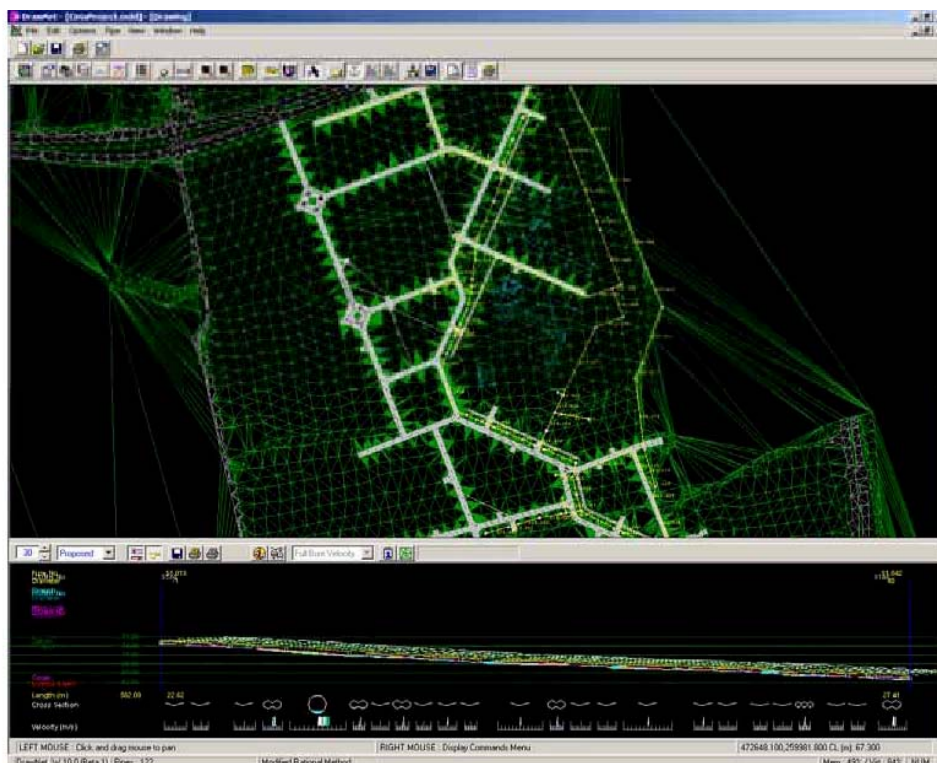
Plan and section of ground model including the position of the highways, swales and surface water pipe system (courtesy MicroDrainage)
